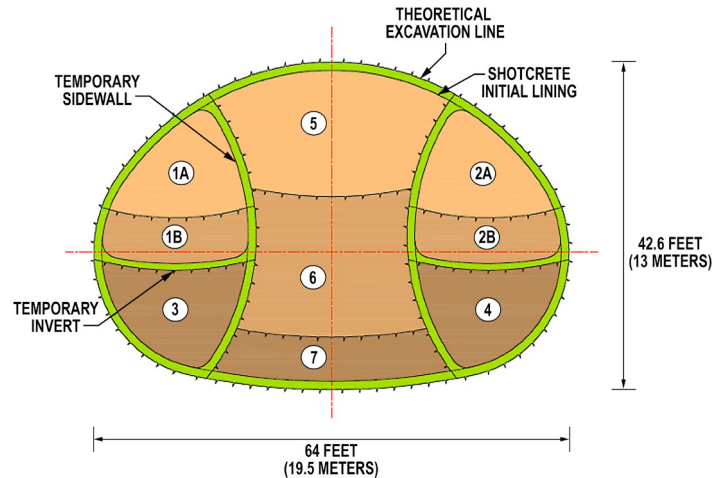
Cross-section with excavation sequence (Stage 1 – 7).
